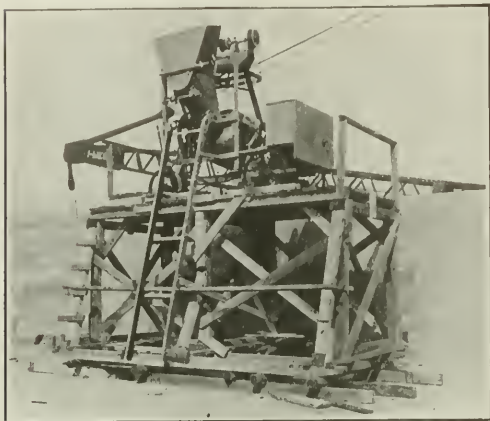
OUTFIT FOR CONCRETING FILTER WALLS
